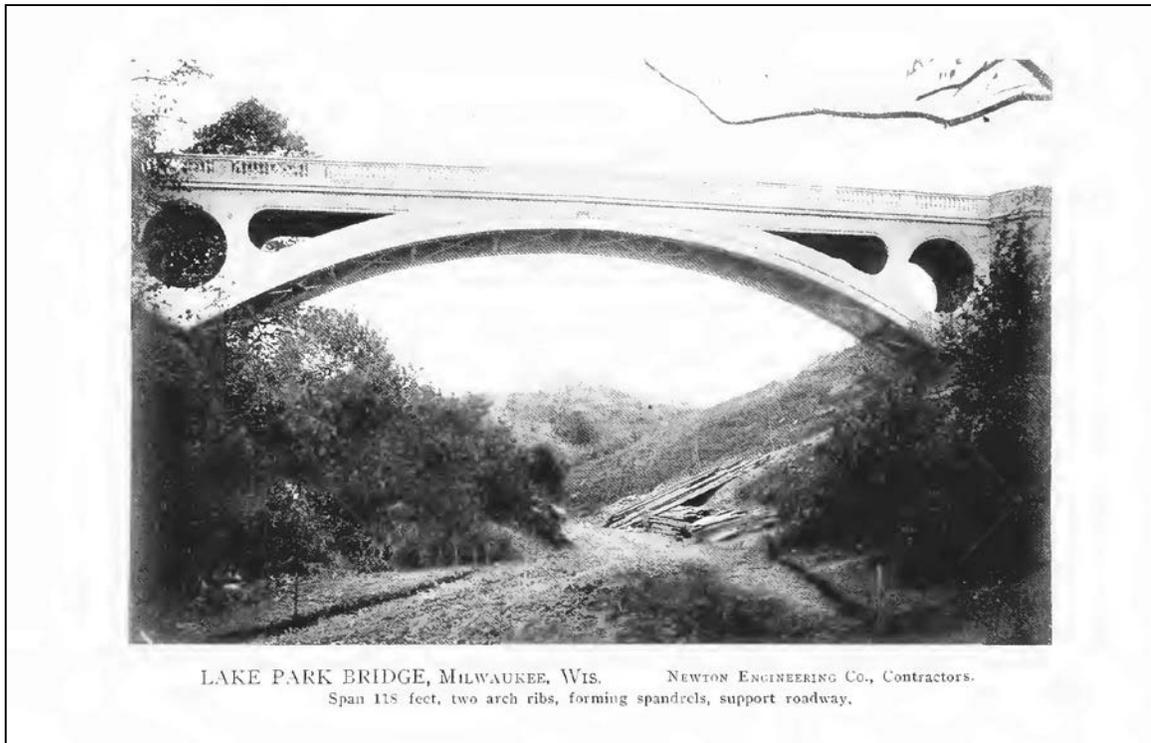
Apparent original construction photo (retrieved from the 1913 Kahn Building Products catalog)
